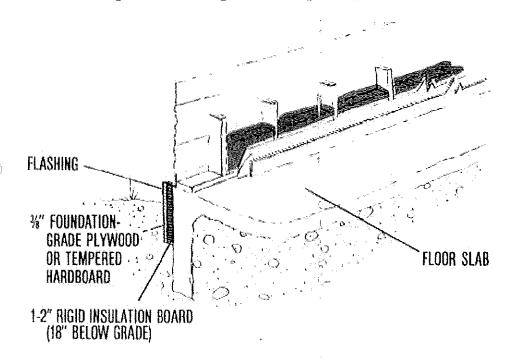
Foundation perimeter insulation-outside (R=2.2). Perimeter insulation along the outside of foundation walls is toe most common method used today Waterproof insulation, protected from vehicle, bird and rodent carnage by a rigid waterproof covering, is an investment that will last the life of the building. Soil should be backfilled to within 6-8 inches of the top of the insulation
